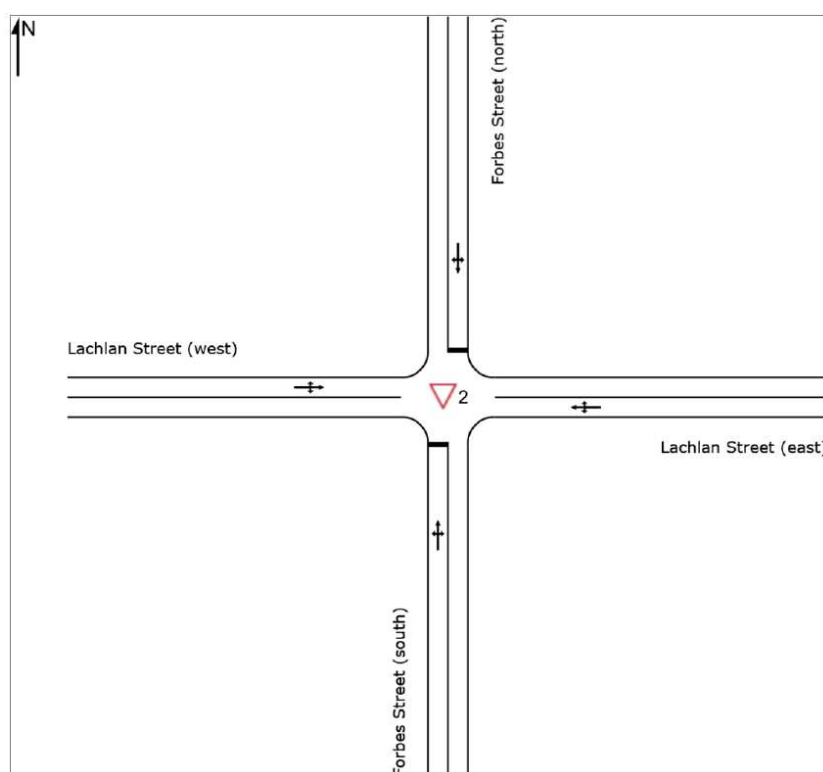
Proposed Lachlan Street/ Forbes Street intersection (alternate layout)
